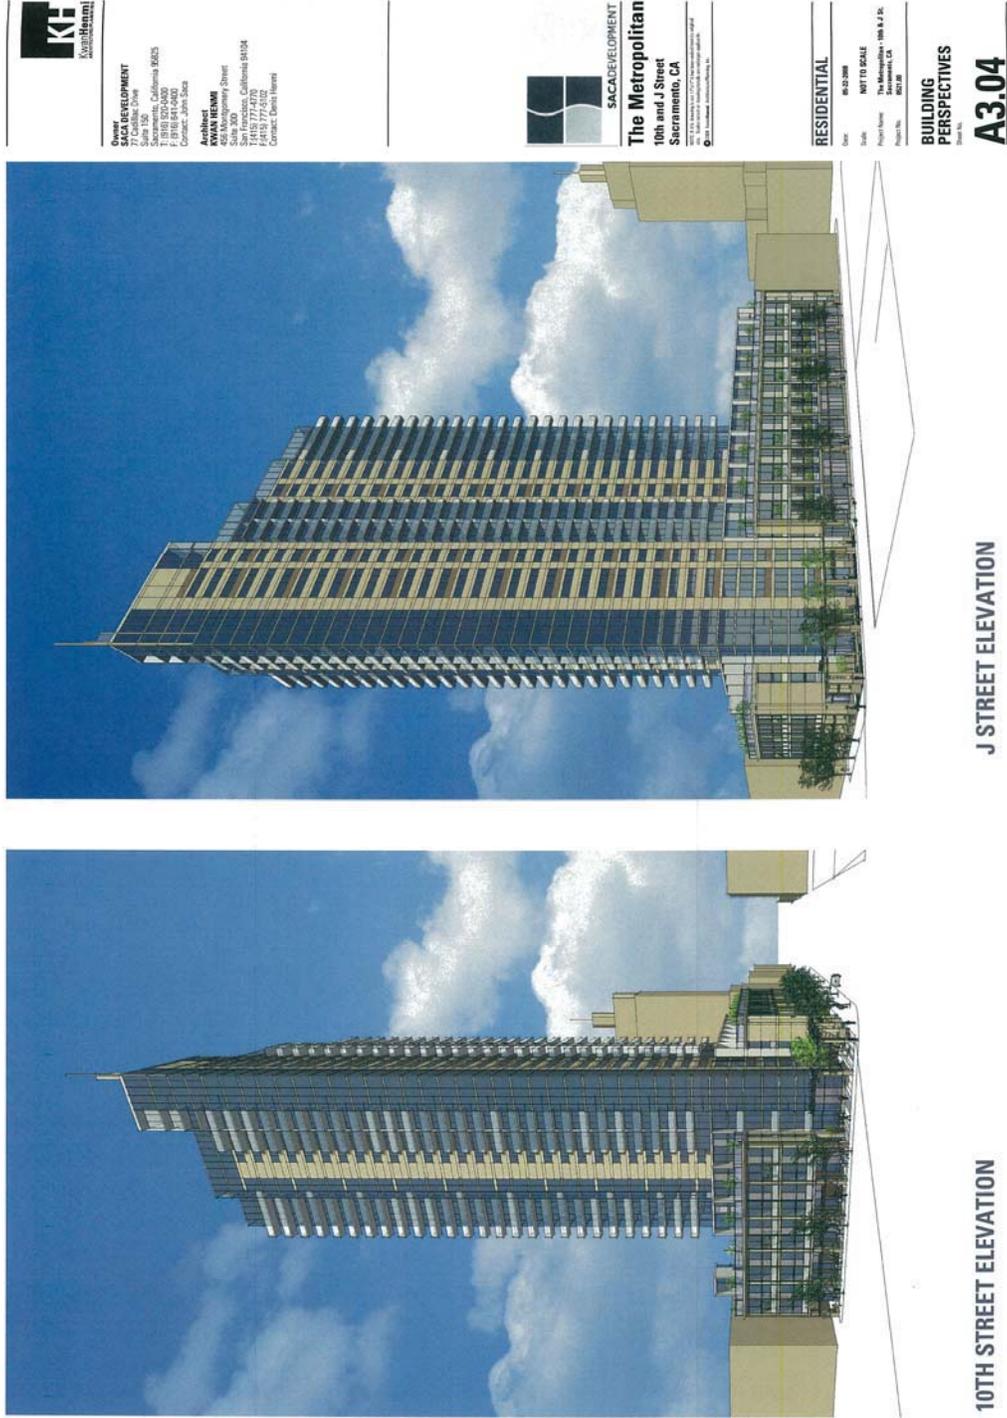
Exhibit R – Building Perspectives (10th Street & East) (320 residential units)
